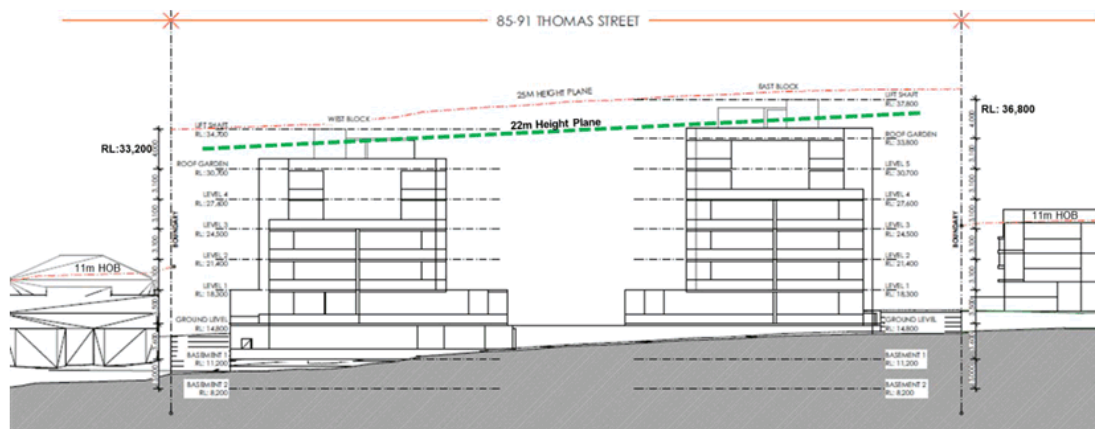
Section facing north from Parramatta River with adjacent properties (Source: PTI Architecture)
